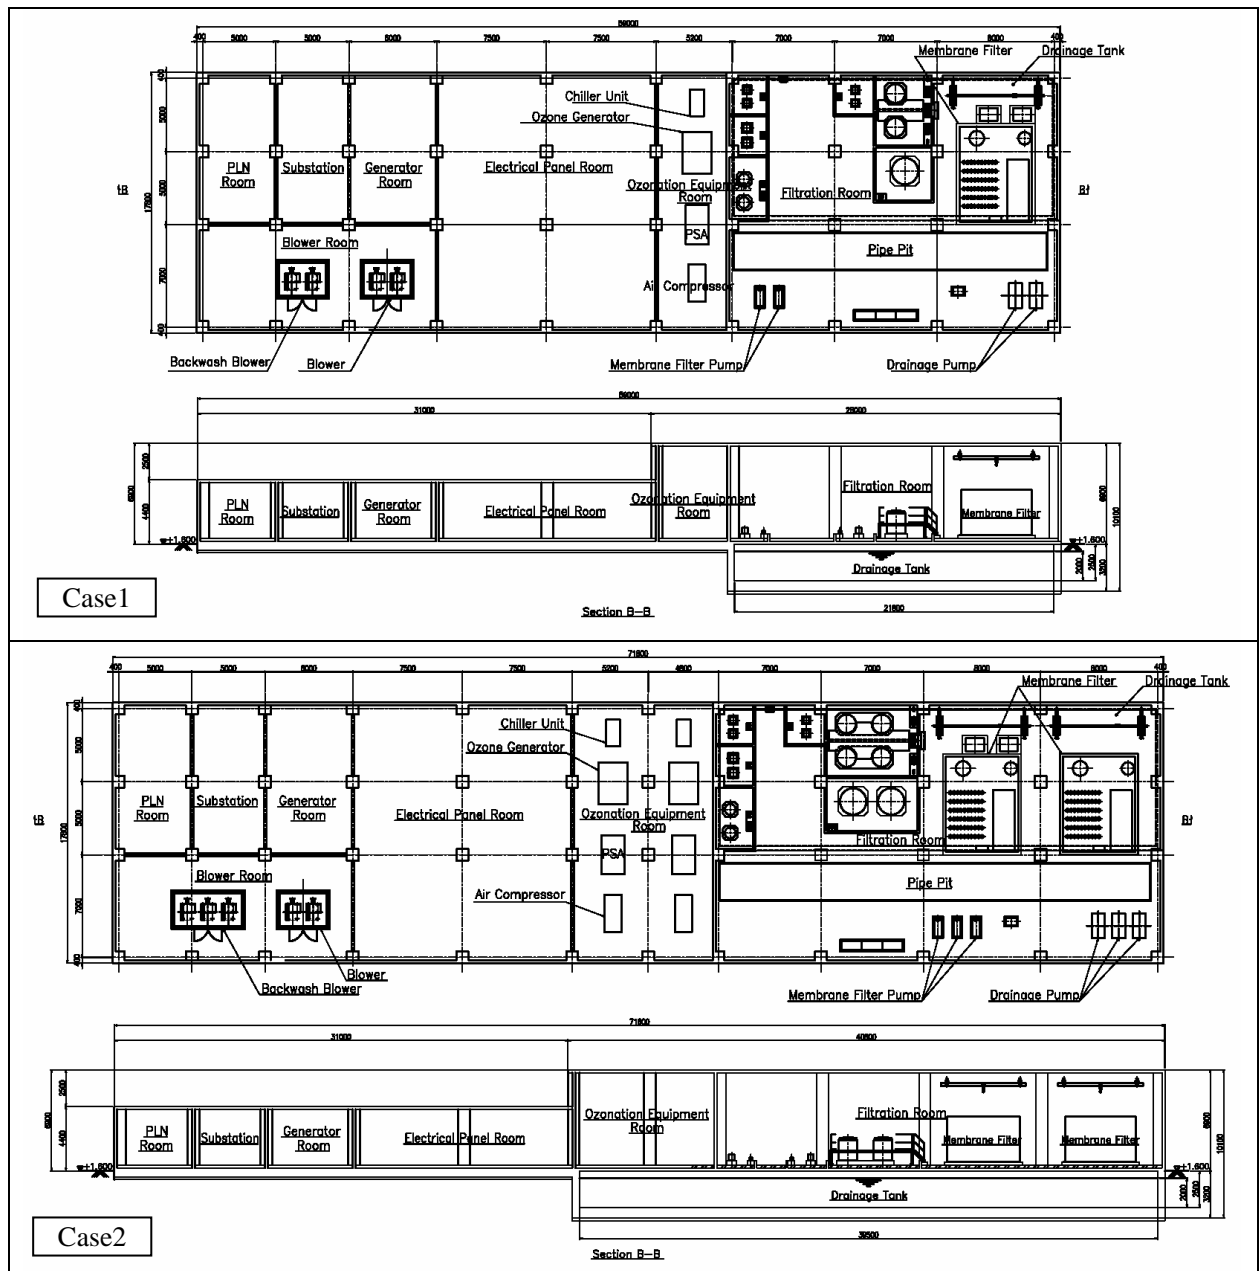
Plan and Section of Membrane Filtration Building
